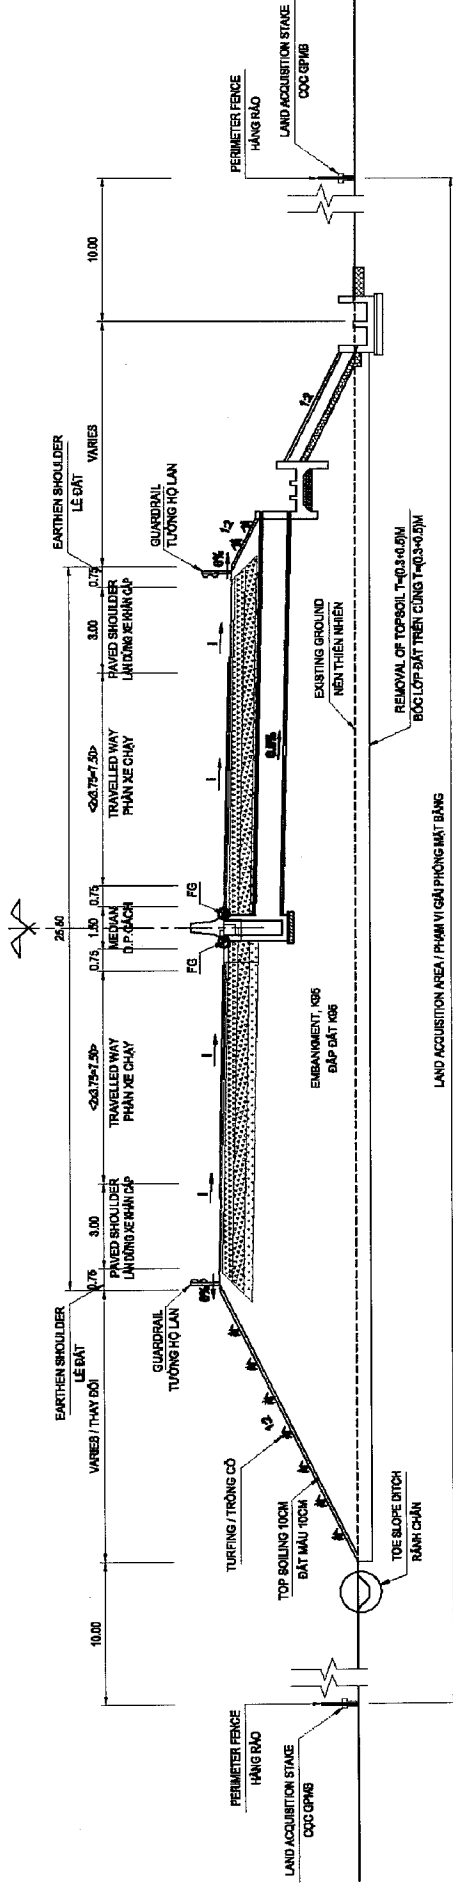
Typical Cross Section of Expressway at Superelevated Section
